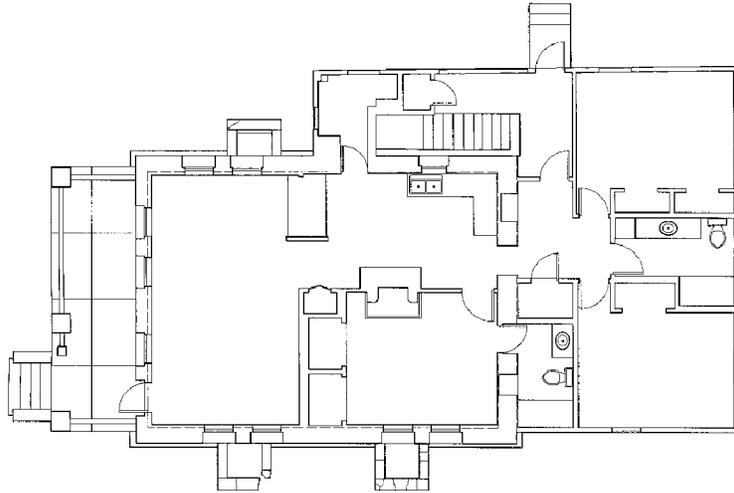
First Floor Plan; North is at left. (Drawing by the author)
